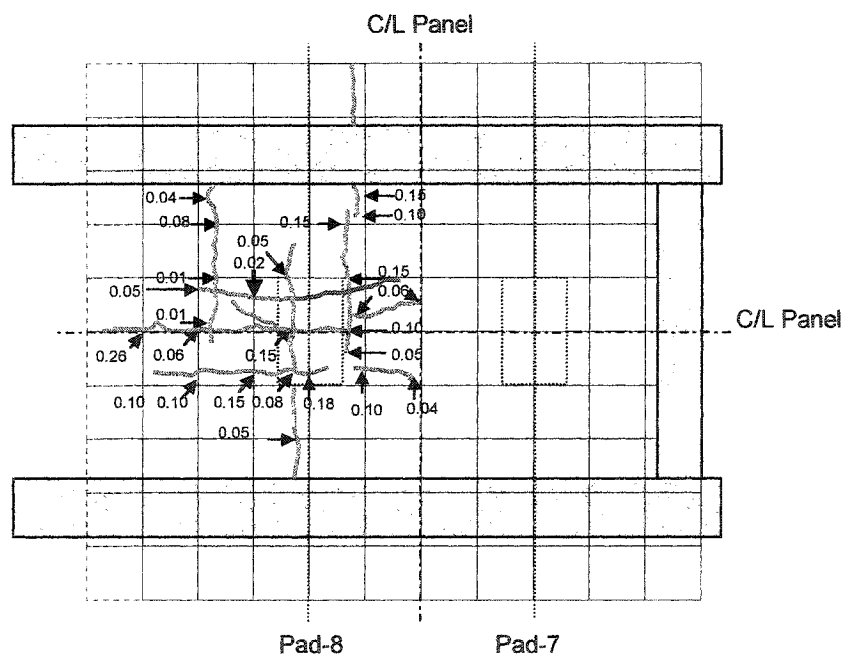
Panel-D: Crack Patterns on Soffit after 100 Load Cycles
